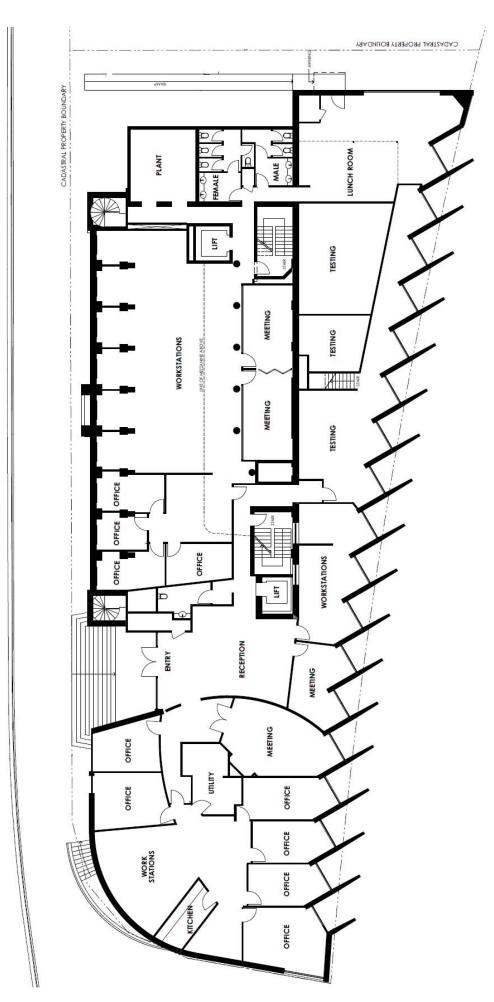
Floor Plan, Level 2 Source: ML Design 2016
